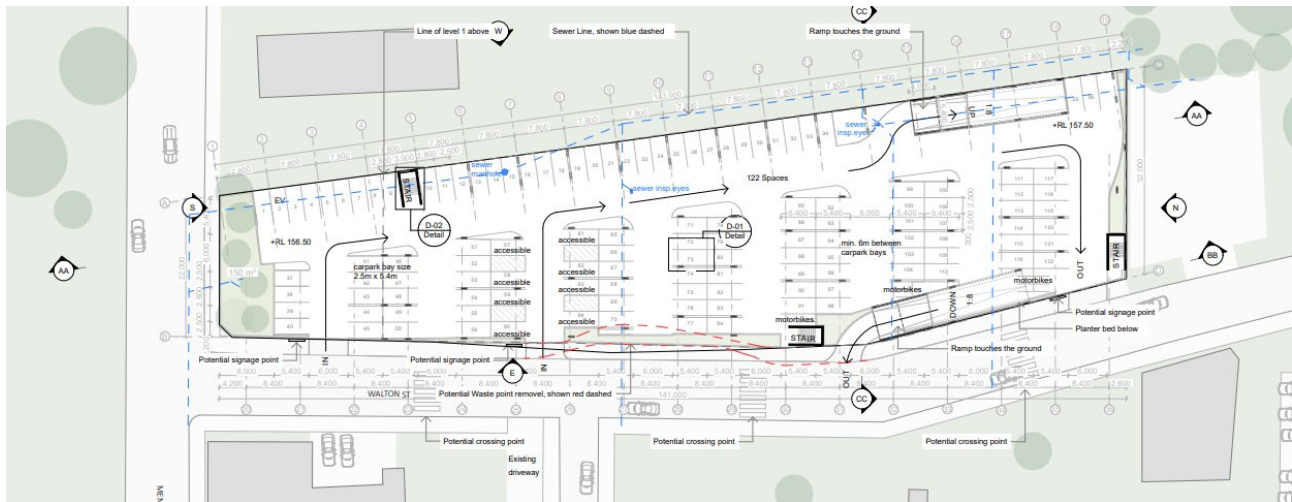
Proposed Car park Entrance on Walton St (Source: Lockhart – Krause Architects)
